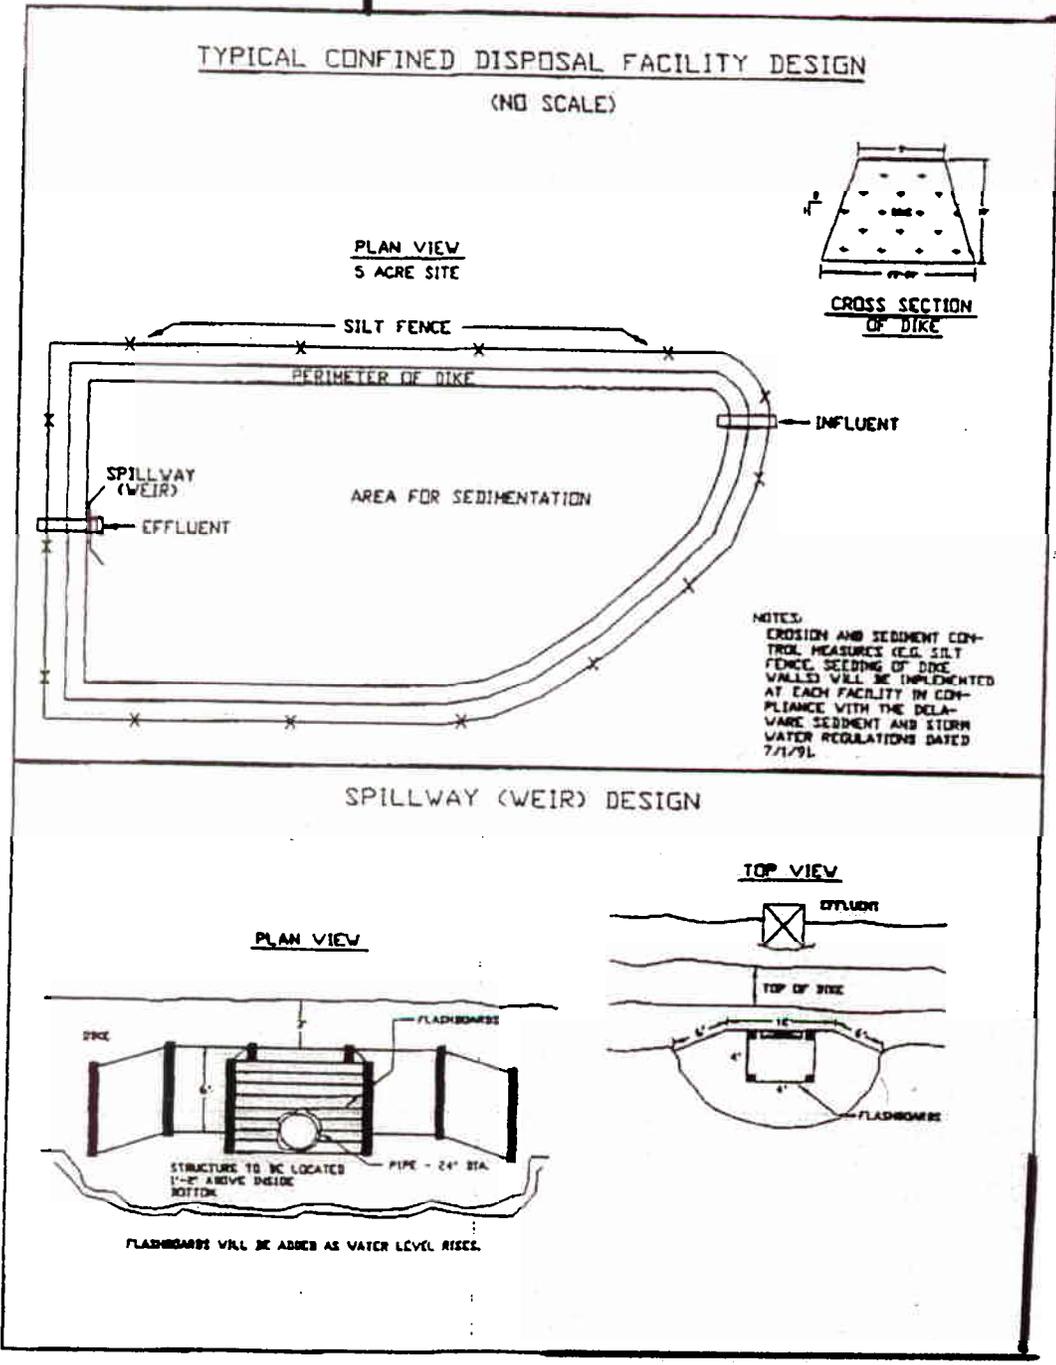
Confined disposal site plans (prepared by Division of Soil and Water Conservation, DNREC).
